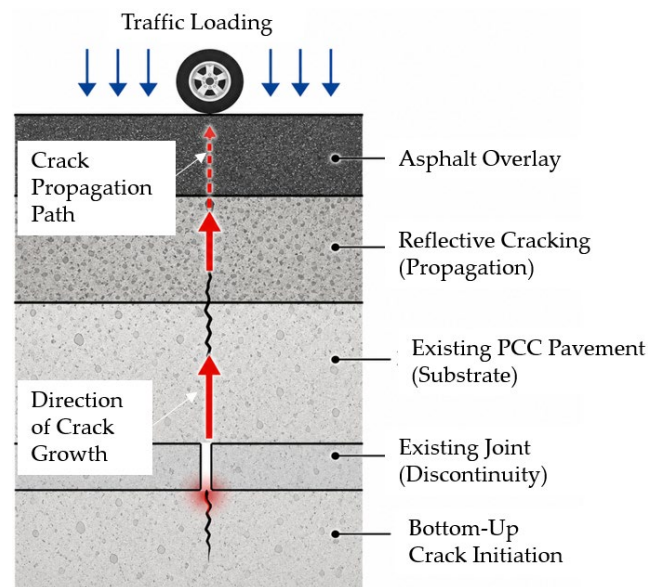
Schematic illustration of the bottom-up reflective cracking mechanism in asphalt-overlaid Portland cement concrete (PCC) pavements
